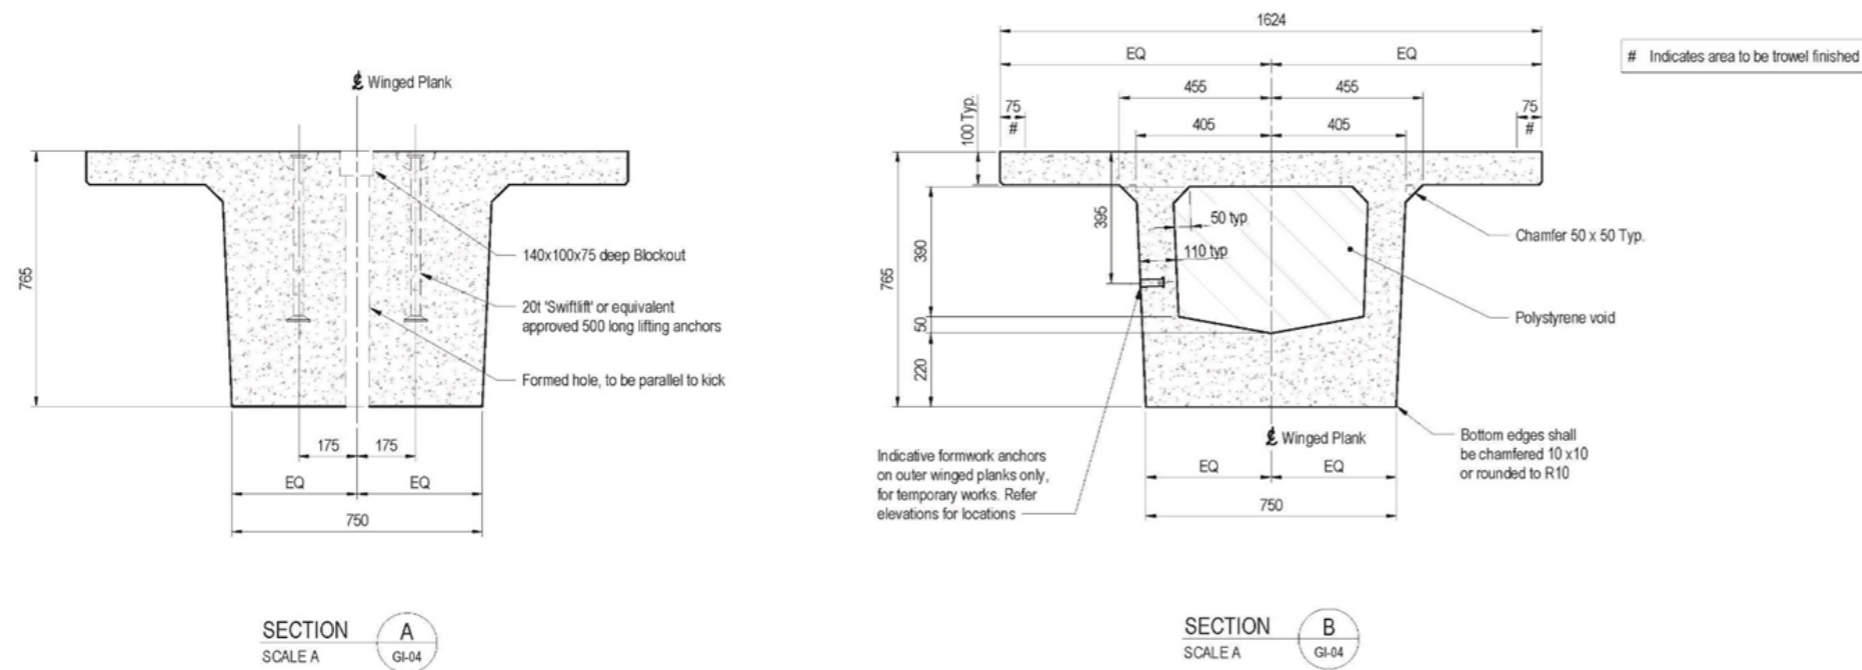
(n) - Example winged plank bridge drawings - Sheet 4
